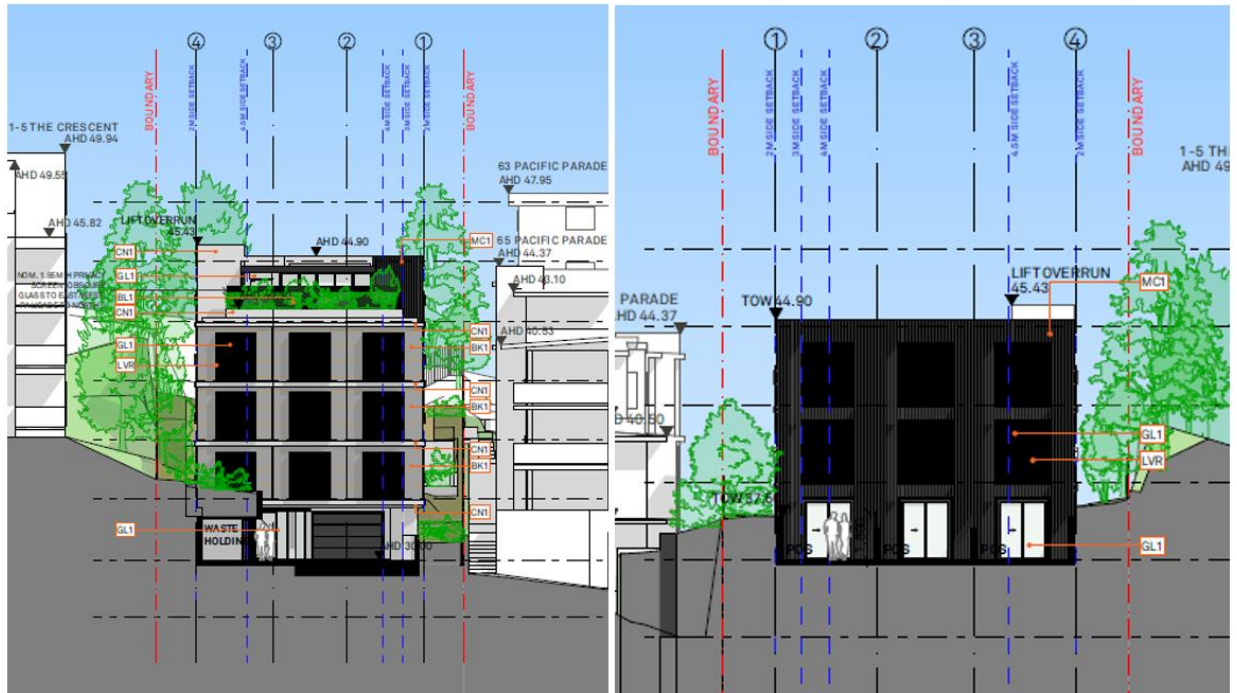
Approved Northern (left) and Southern (right) elevations under DA2020/1597.
